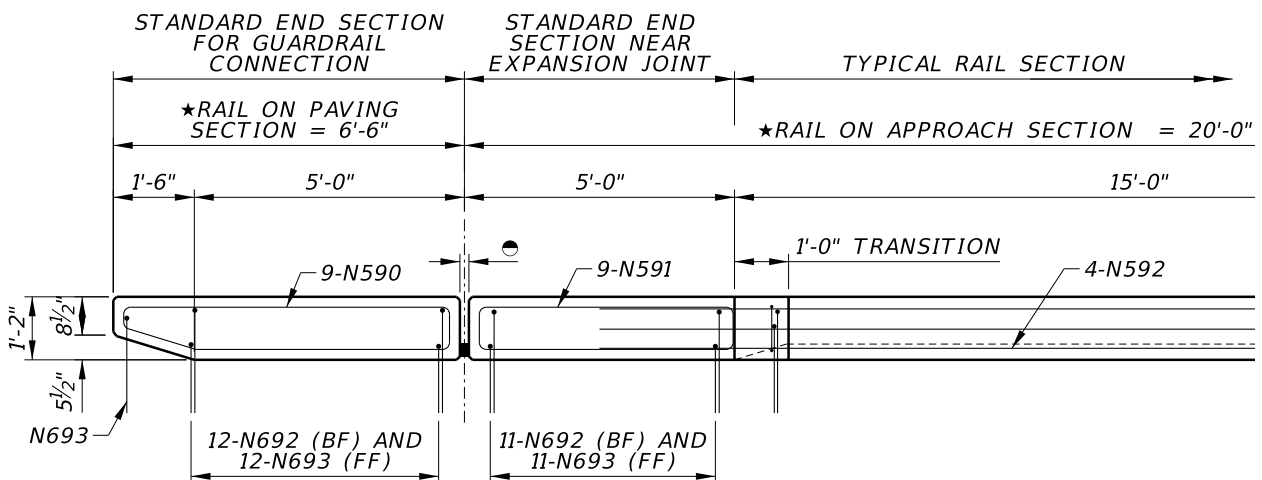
Plan View of Standard Legacy Rail End Sections (NCHRP 350)
